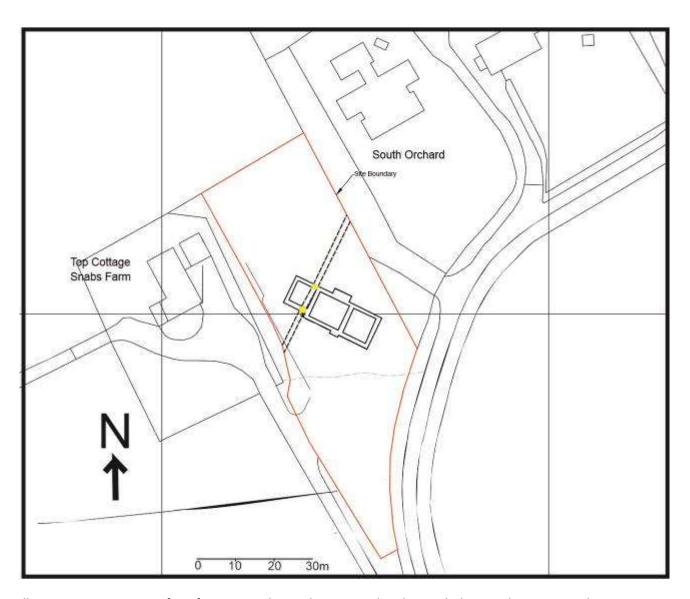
sections of cut feature 102 located, excavated and recorded in North Eastern and South Western foundation trenches for new house.
